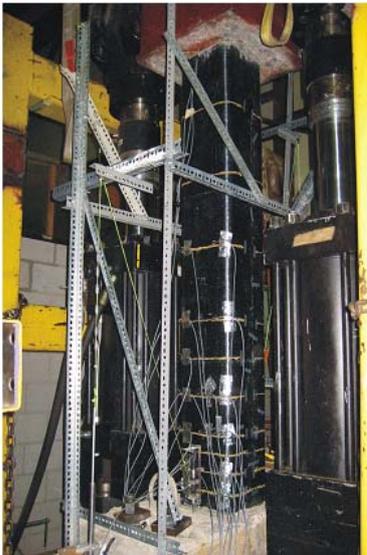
(a). Test Setup of Instrumented FRP/Concrete Column
